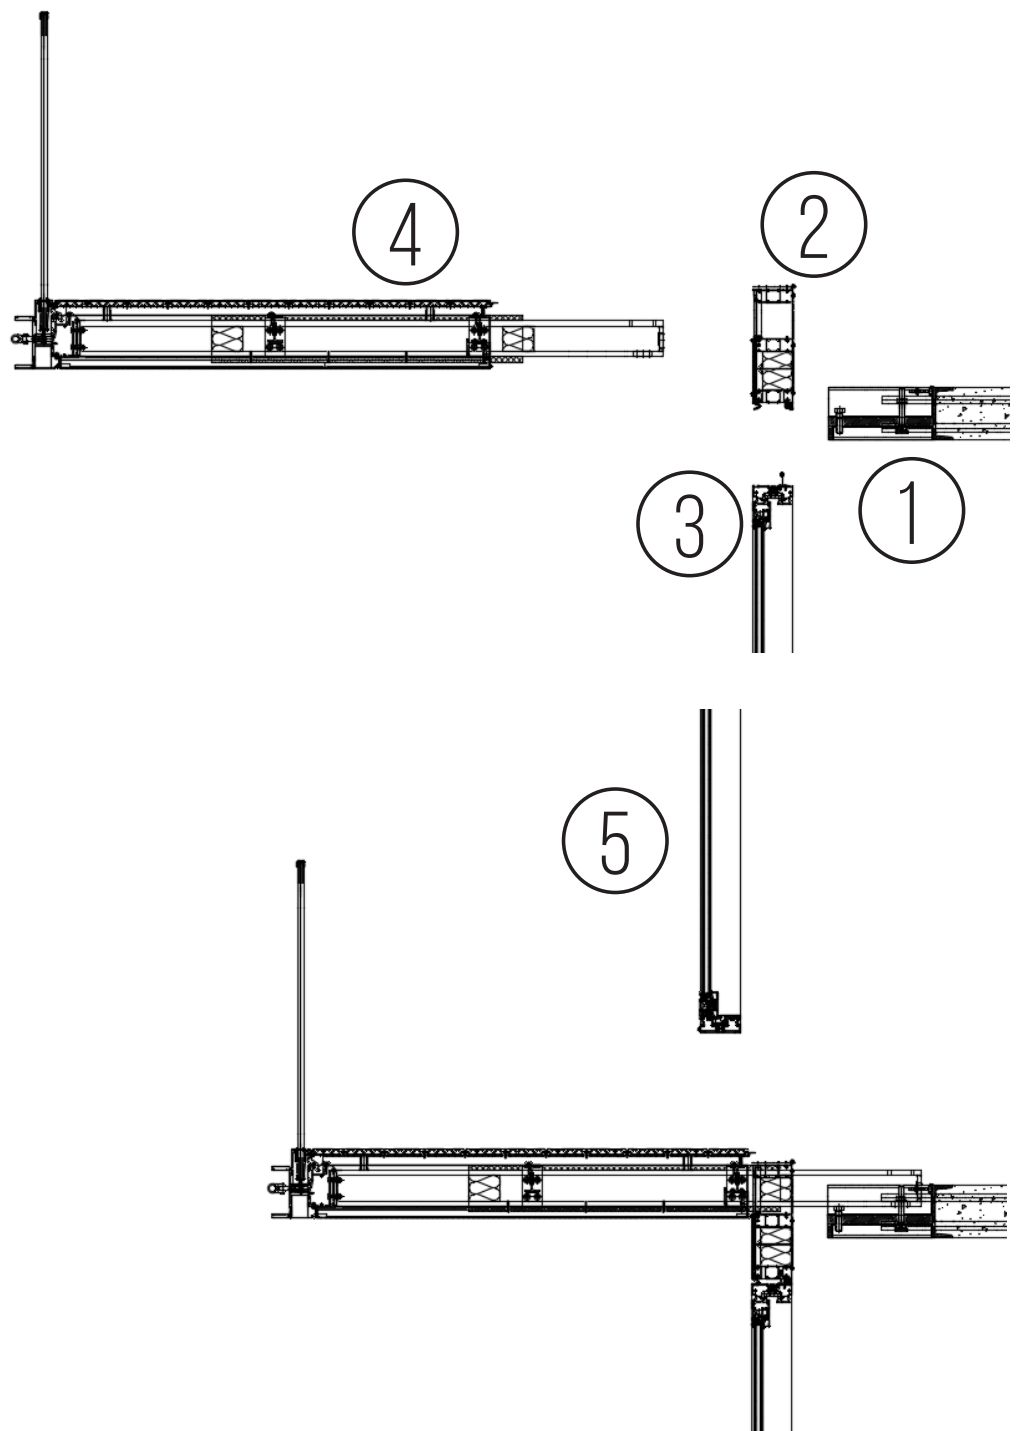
Details Type 2 (Scheldebouw, 2019)
